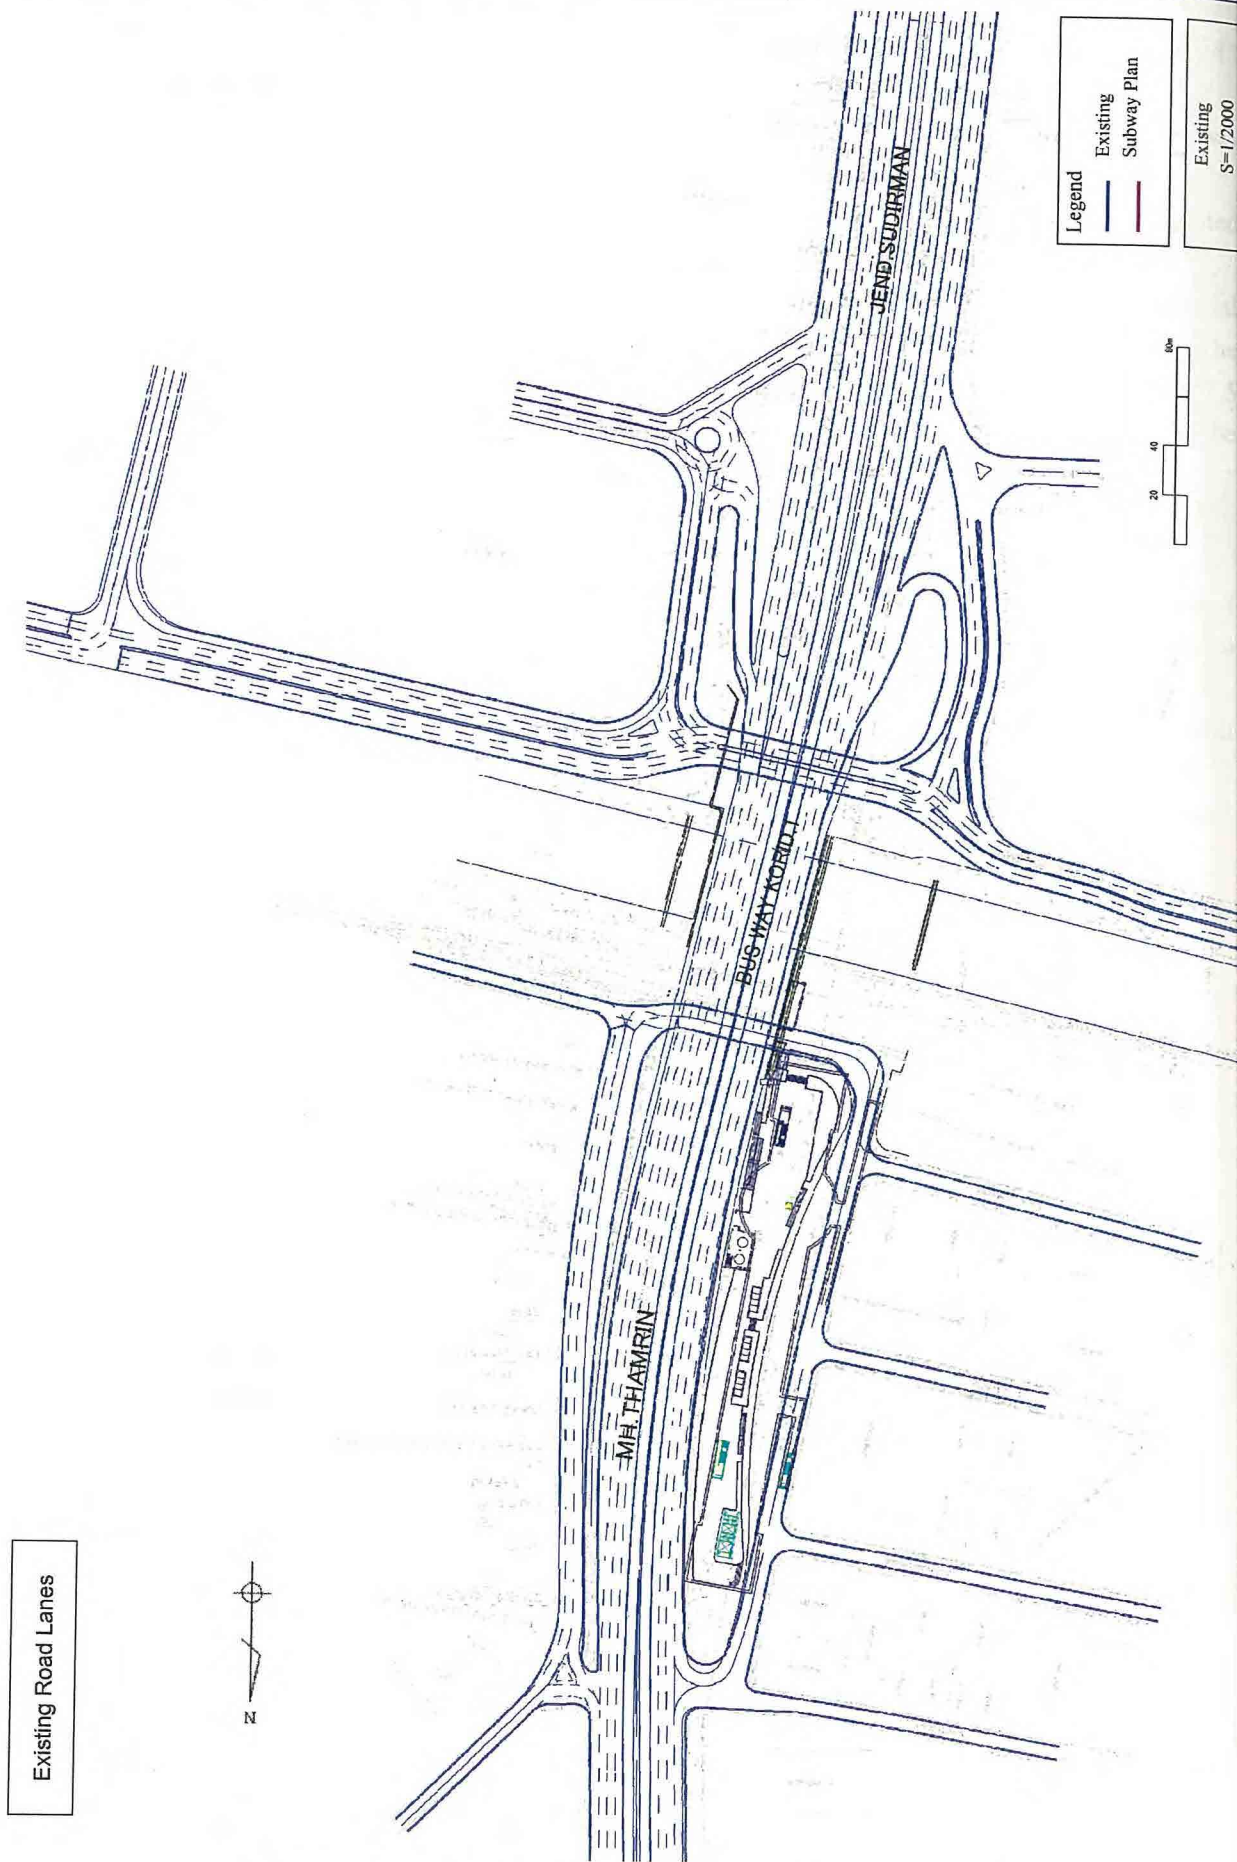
Existing Road Lanes (Source: Study Team)
